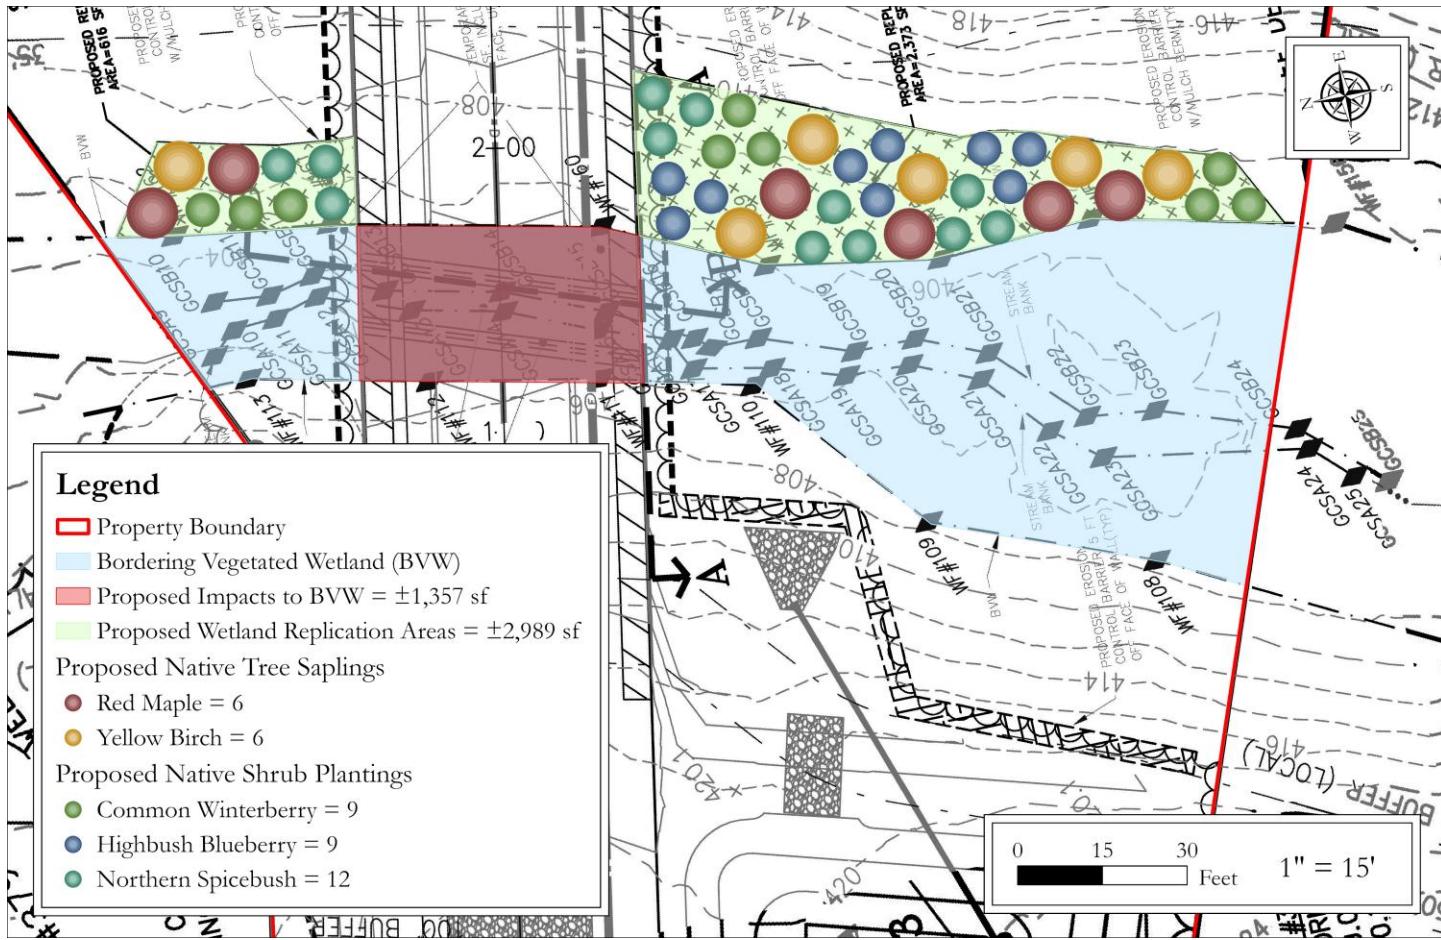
Proposed wetland replication planting plan adjacent to the proposed wetland crossing.
